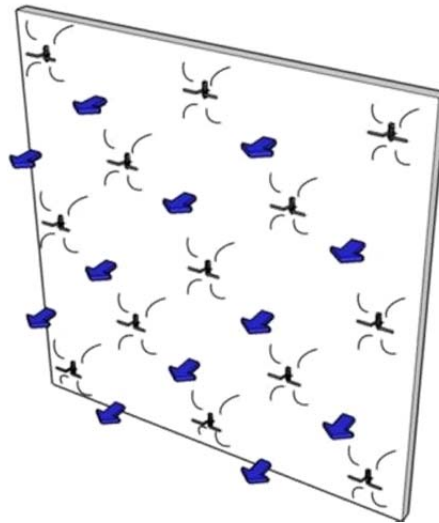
Sealed Sheathing Membrane Air Barrier Approach with Brick Ties. A limitation of the sealed sheathing membrane approach is the potential for the air barrier membrane (and WRB) to tear or become damaged around brick-tie penetrations. Solutions include SAM reinforcement over the sheathing membrane at the fastener locations or use of self-adhered and liquid membranes.
